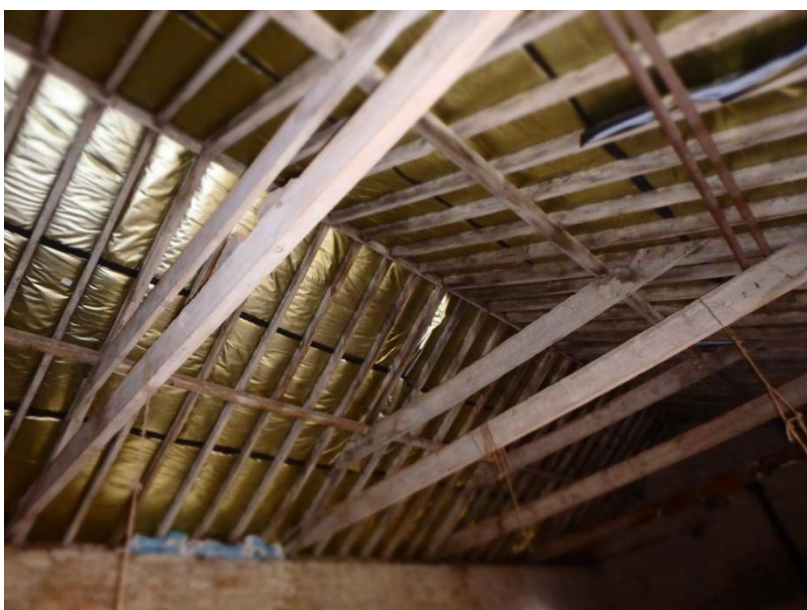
View of the roof supporting structure of the North Range, from the west
